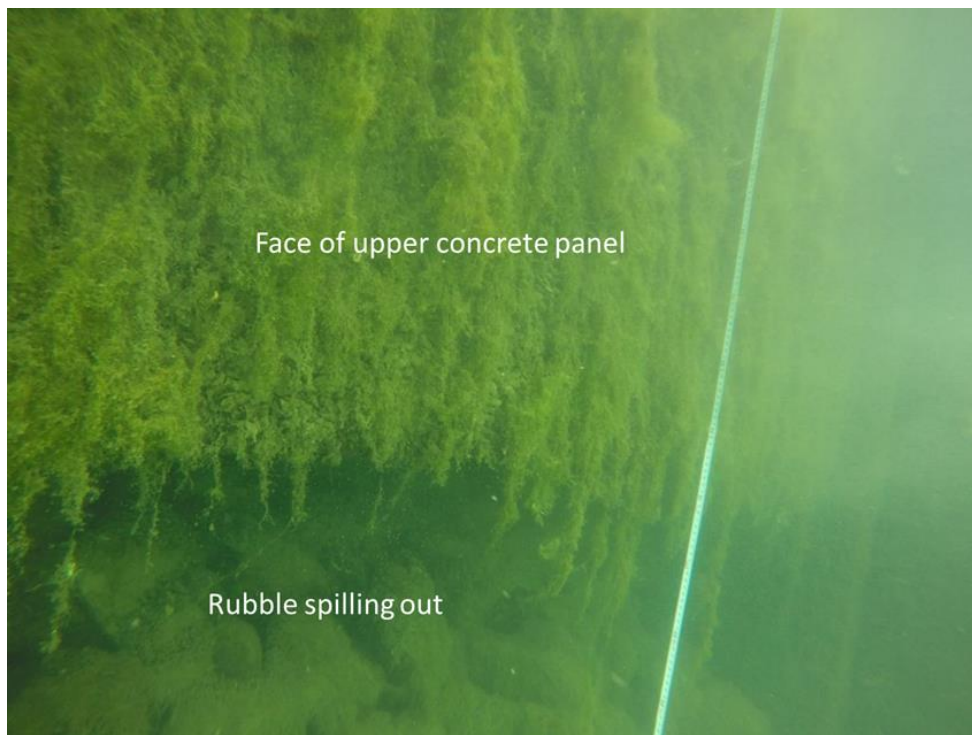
Concrete rubble spilling out below concrete upper outer face wall at Pumphouse 3
